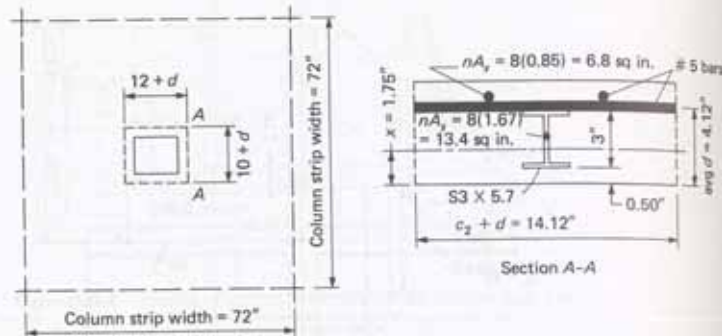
Cracked slab section of width $(c_2 + d)$. Example 16.16.2.
